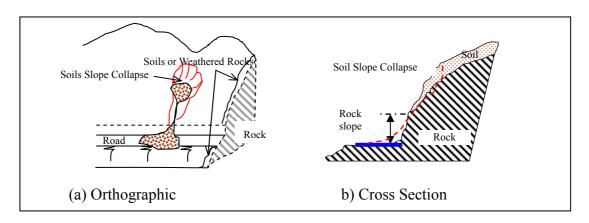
Schematic Illustration of Soil Slope Collapse
